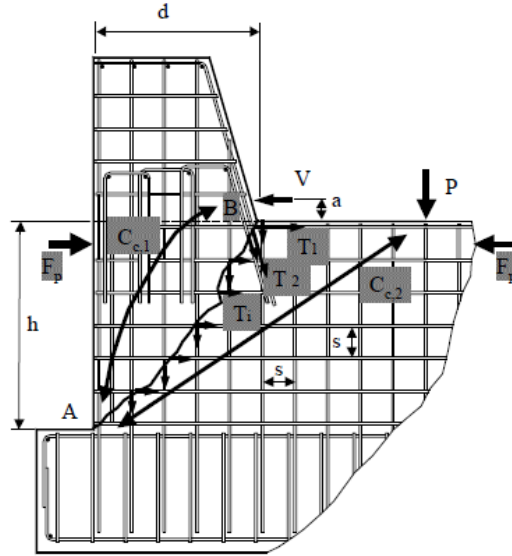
Strut-and-tie model to calculate diagonal shear strength of stem walls
